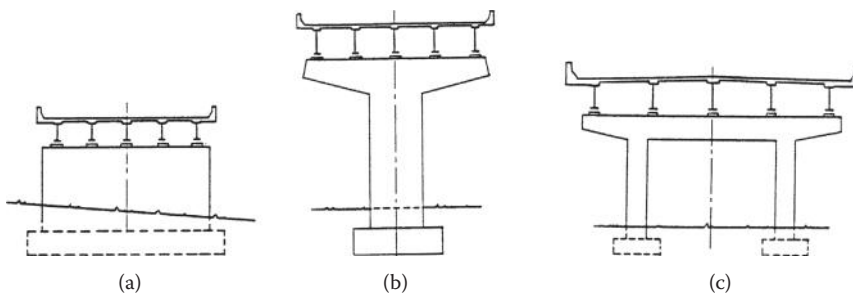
Typical pier types for steel bridges: (a) Solid wall pier (b) Hammerhead pier (c) Rigid frame pier.
